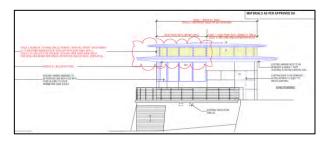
Approved north (promenade) elevation of Lifeguard Tower, Tunnel 2 and Amenities block.
